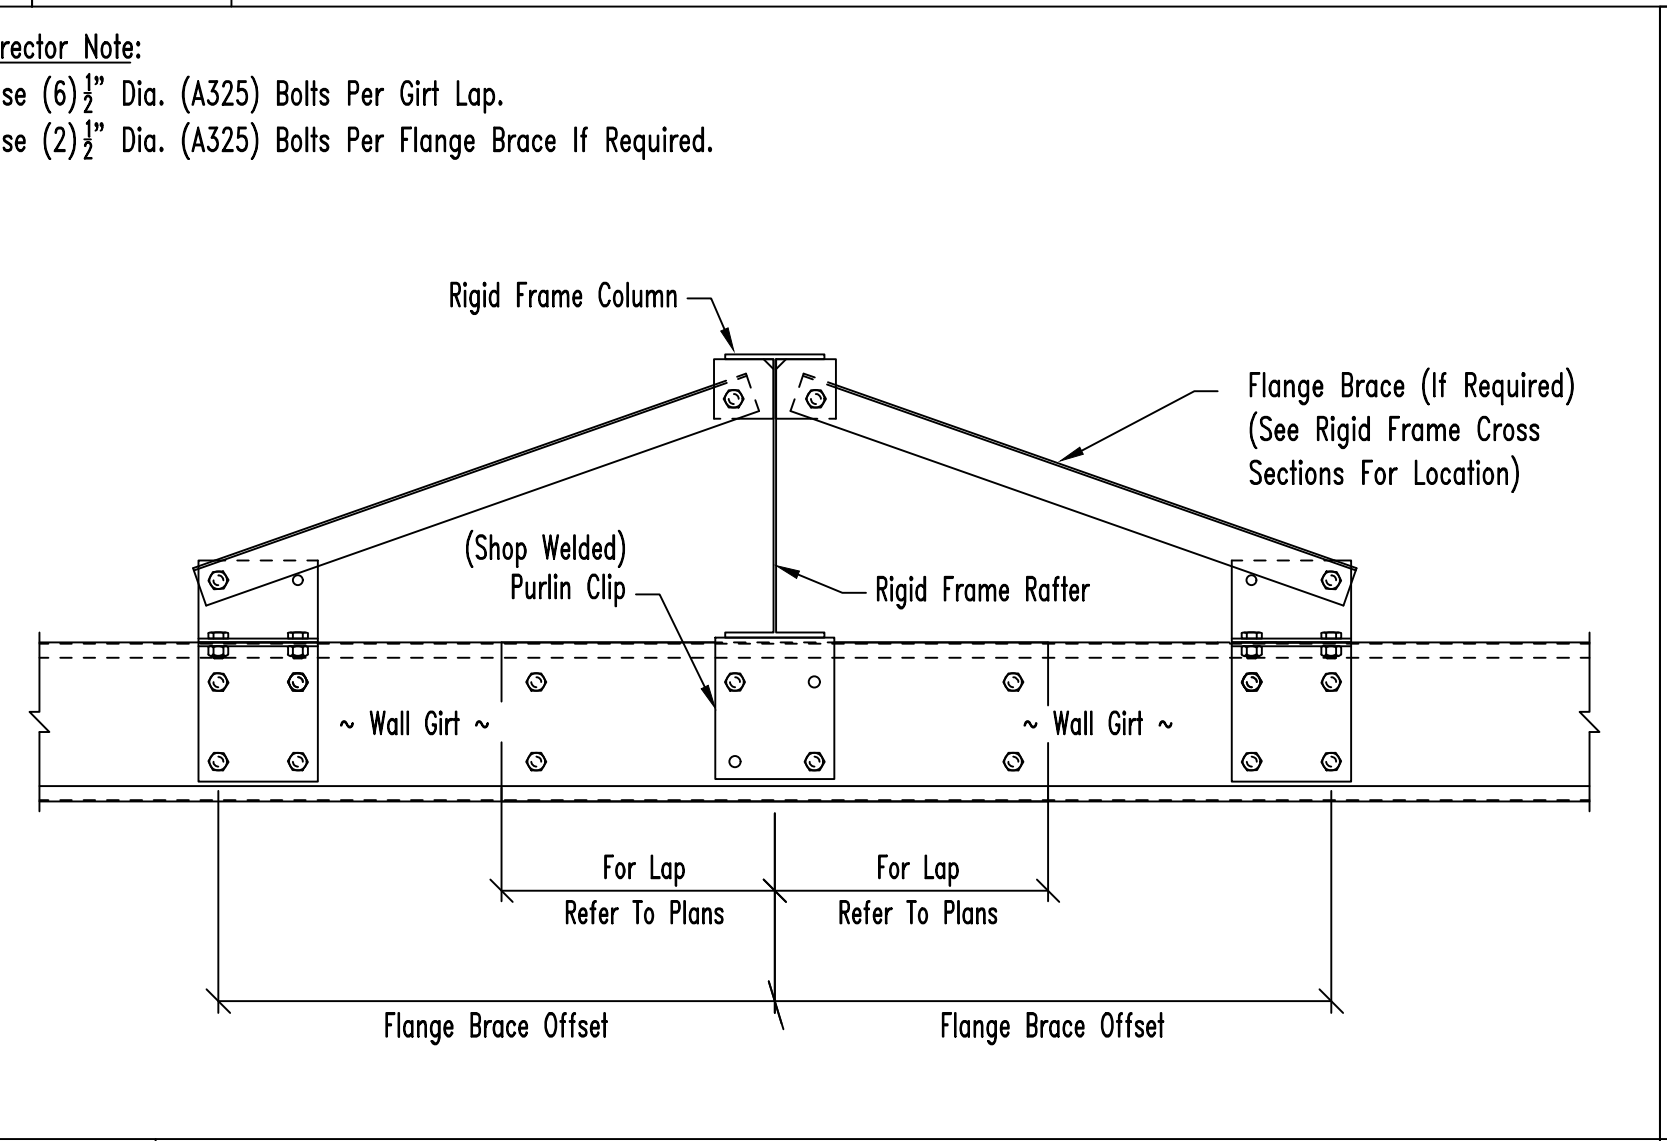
Roof Purlin To Interior Frame Rafter
